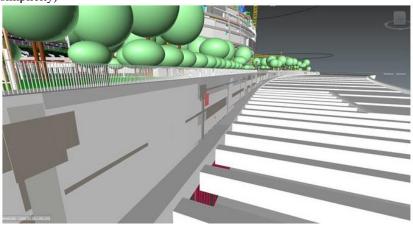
Close up view showing interfacing wall layout (Exhaust Louvre not shown for simplicity)
